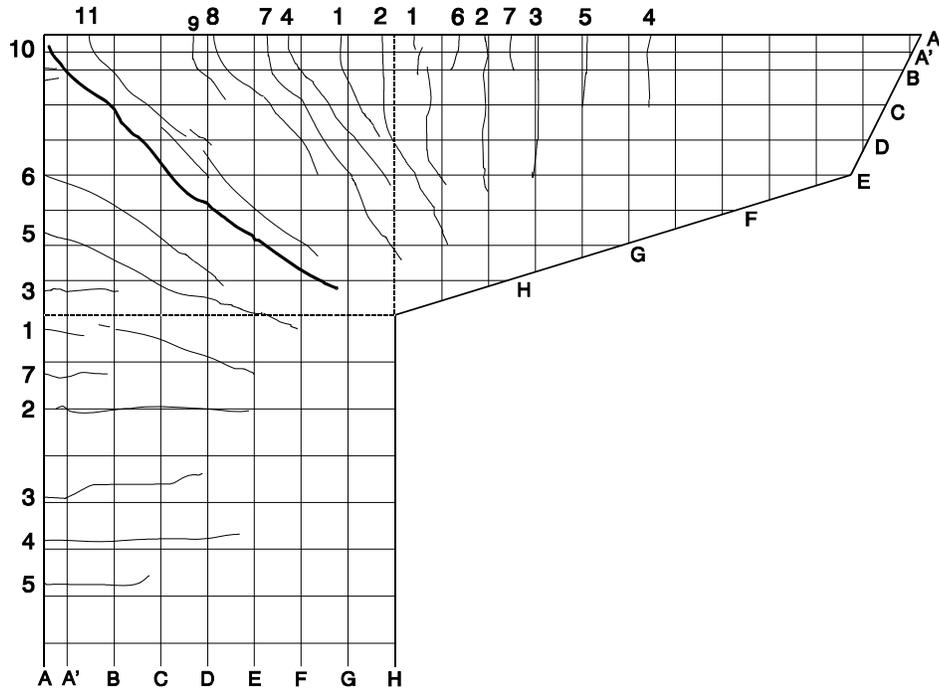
POJ-RC-100 cracking pattern on north face of specimen at failure
